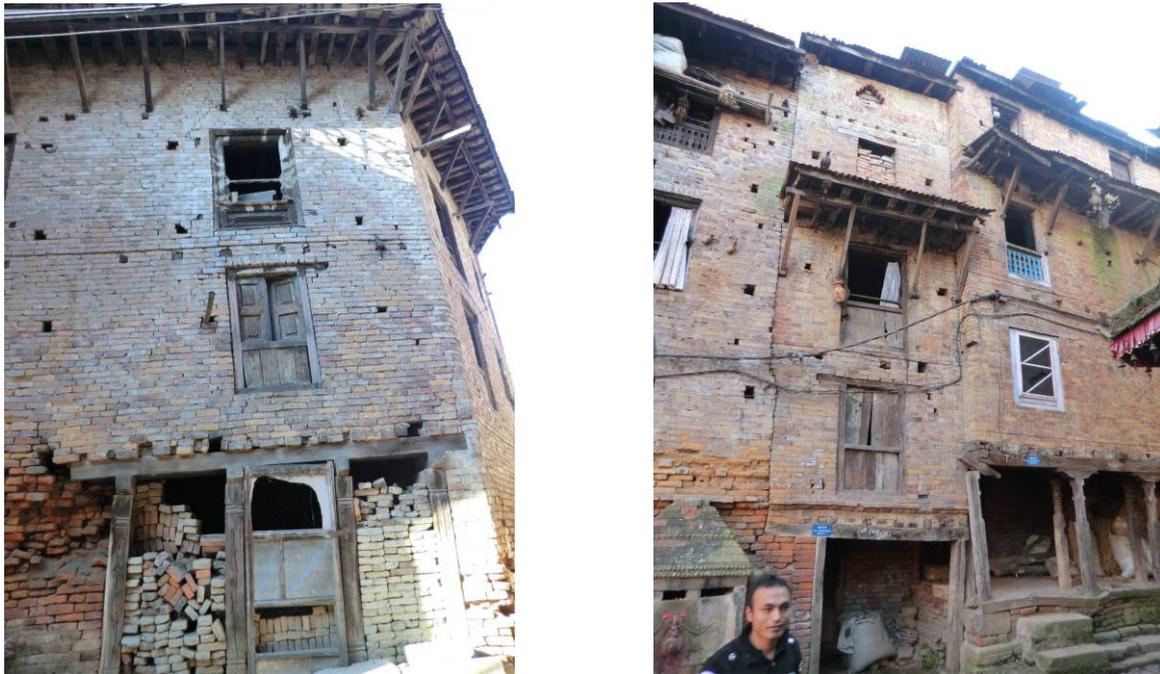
Buildings in poor-condition, partially resting on timber frames, which did not suffer serious damage.
